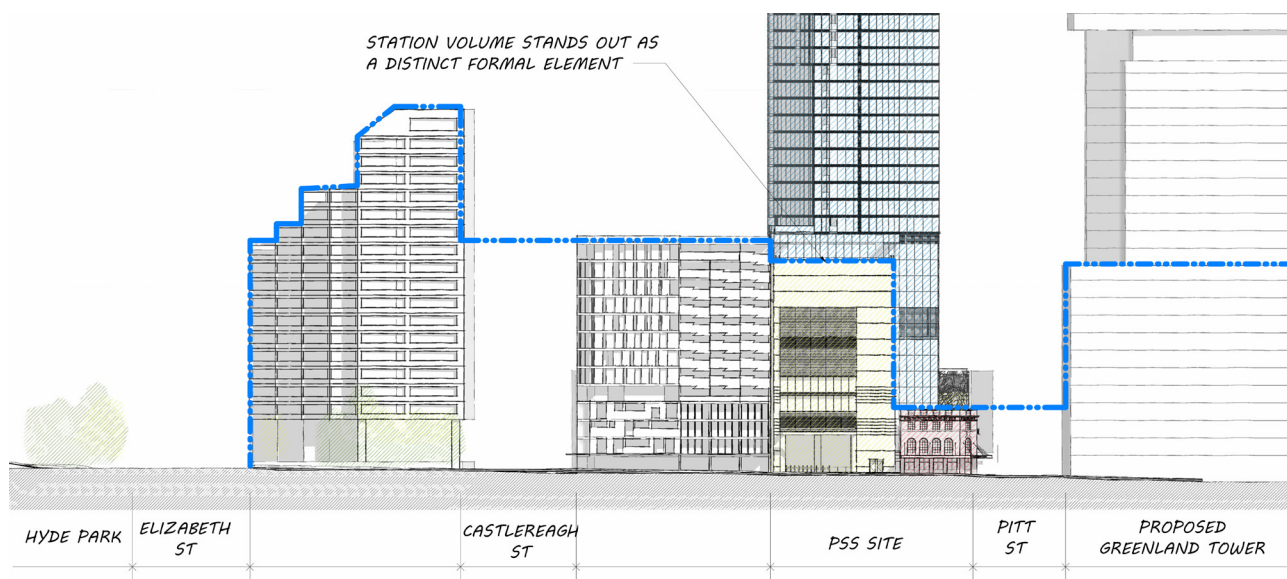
Indicative Street Wall Response - Bathurst Street Elevation
